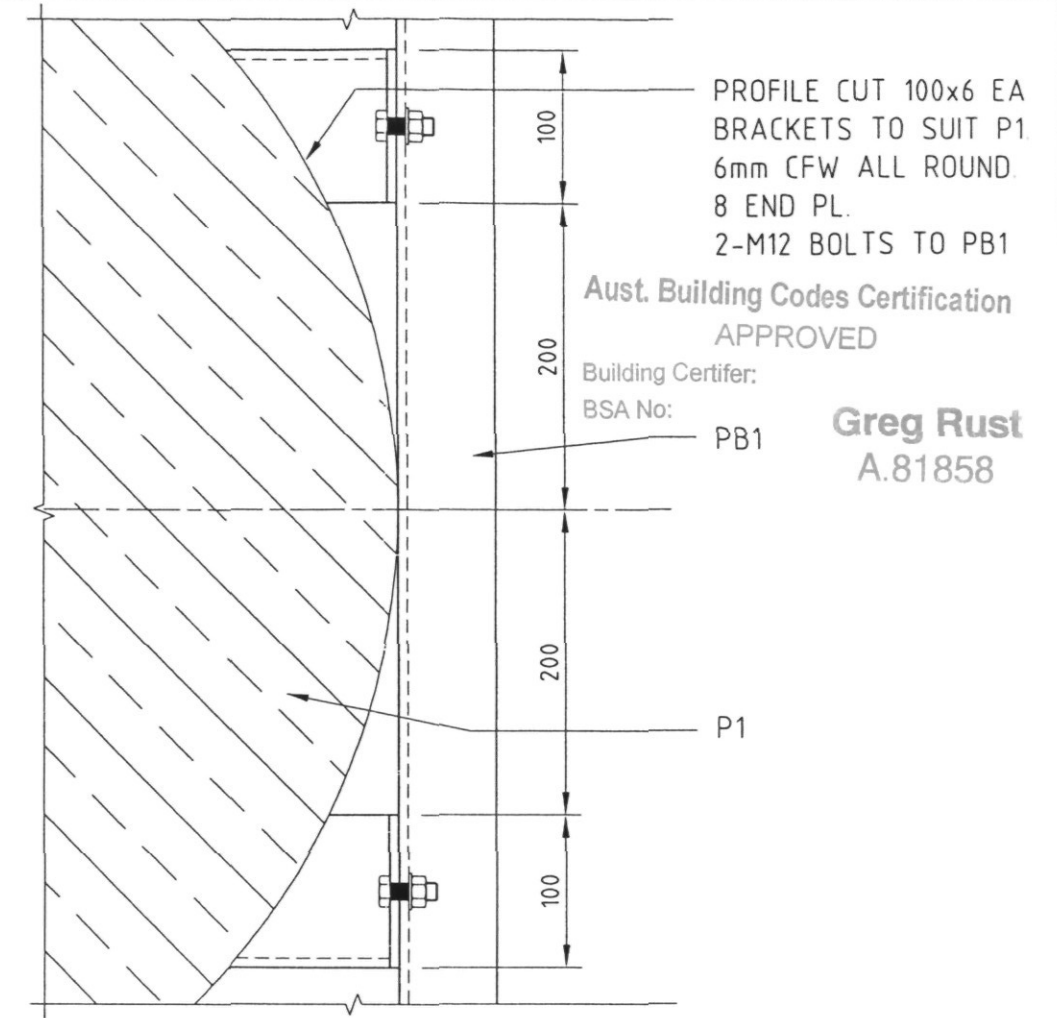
MAIN PYLON TO UPPER PYLON TO TORSION TUBE CONNECTION DETAILS
